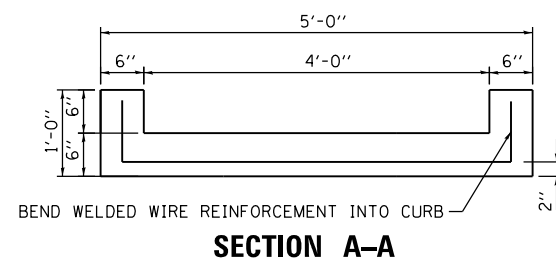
PARTIAL PAVED DITCH PLAN AT DRAINAGE STRUCTURES
